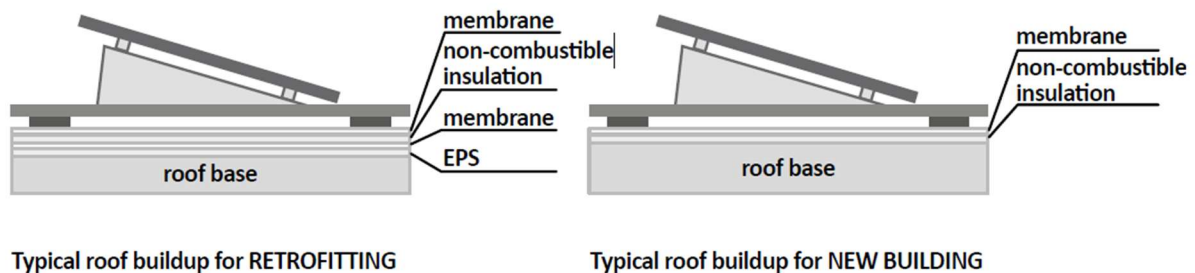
Sketches of typical roofs buildups for retrofits (left) and new builds (right)(7).
